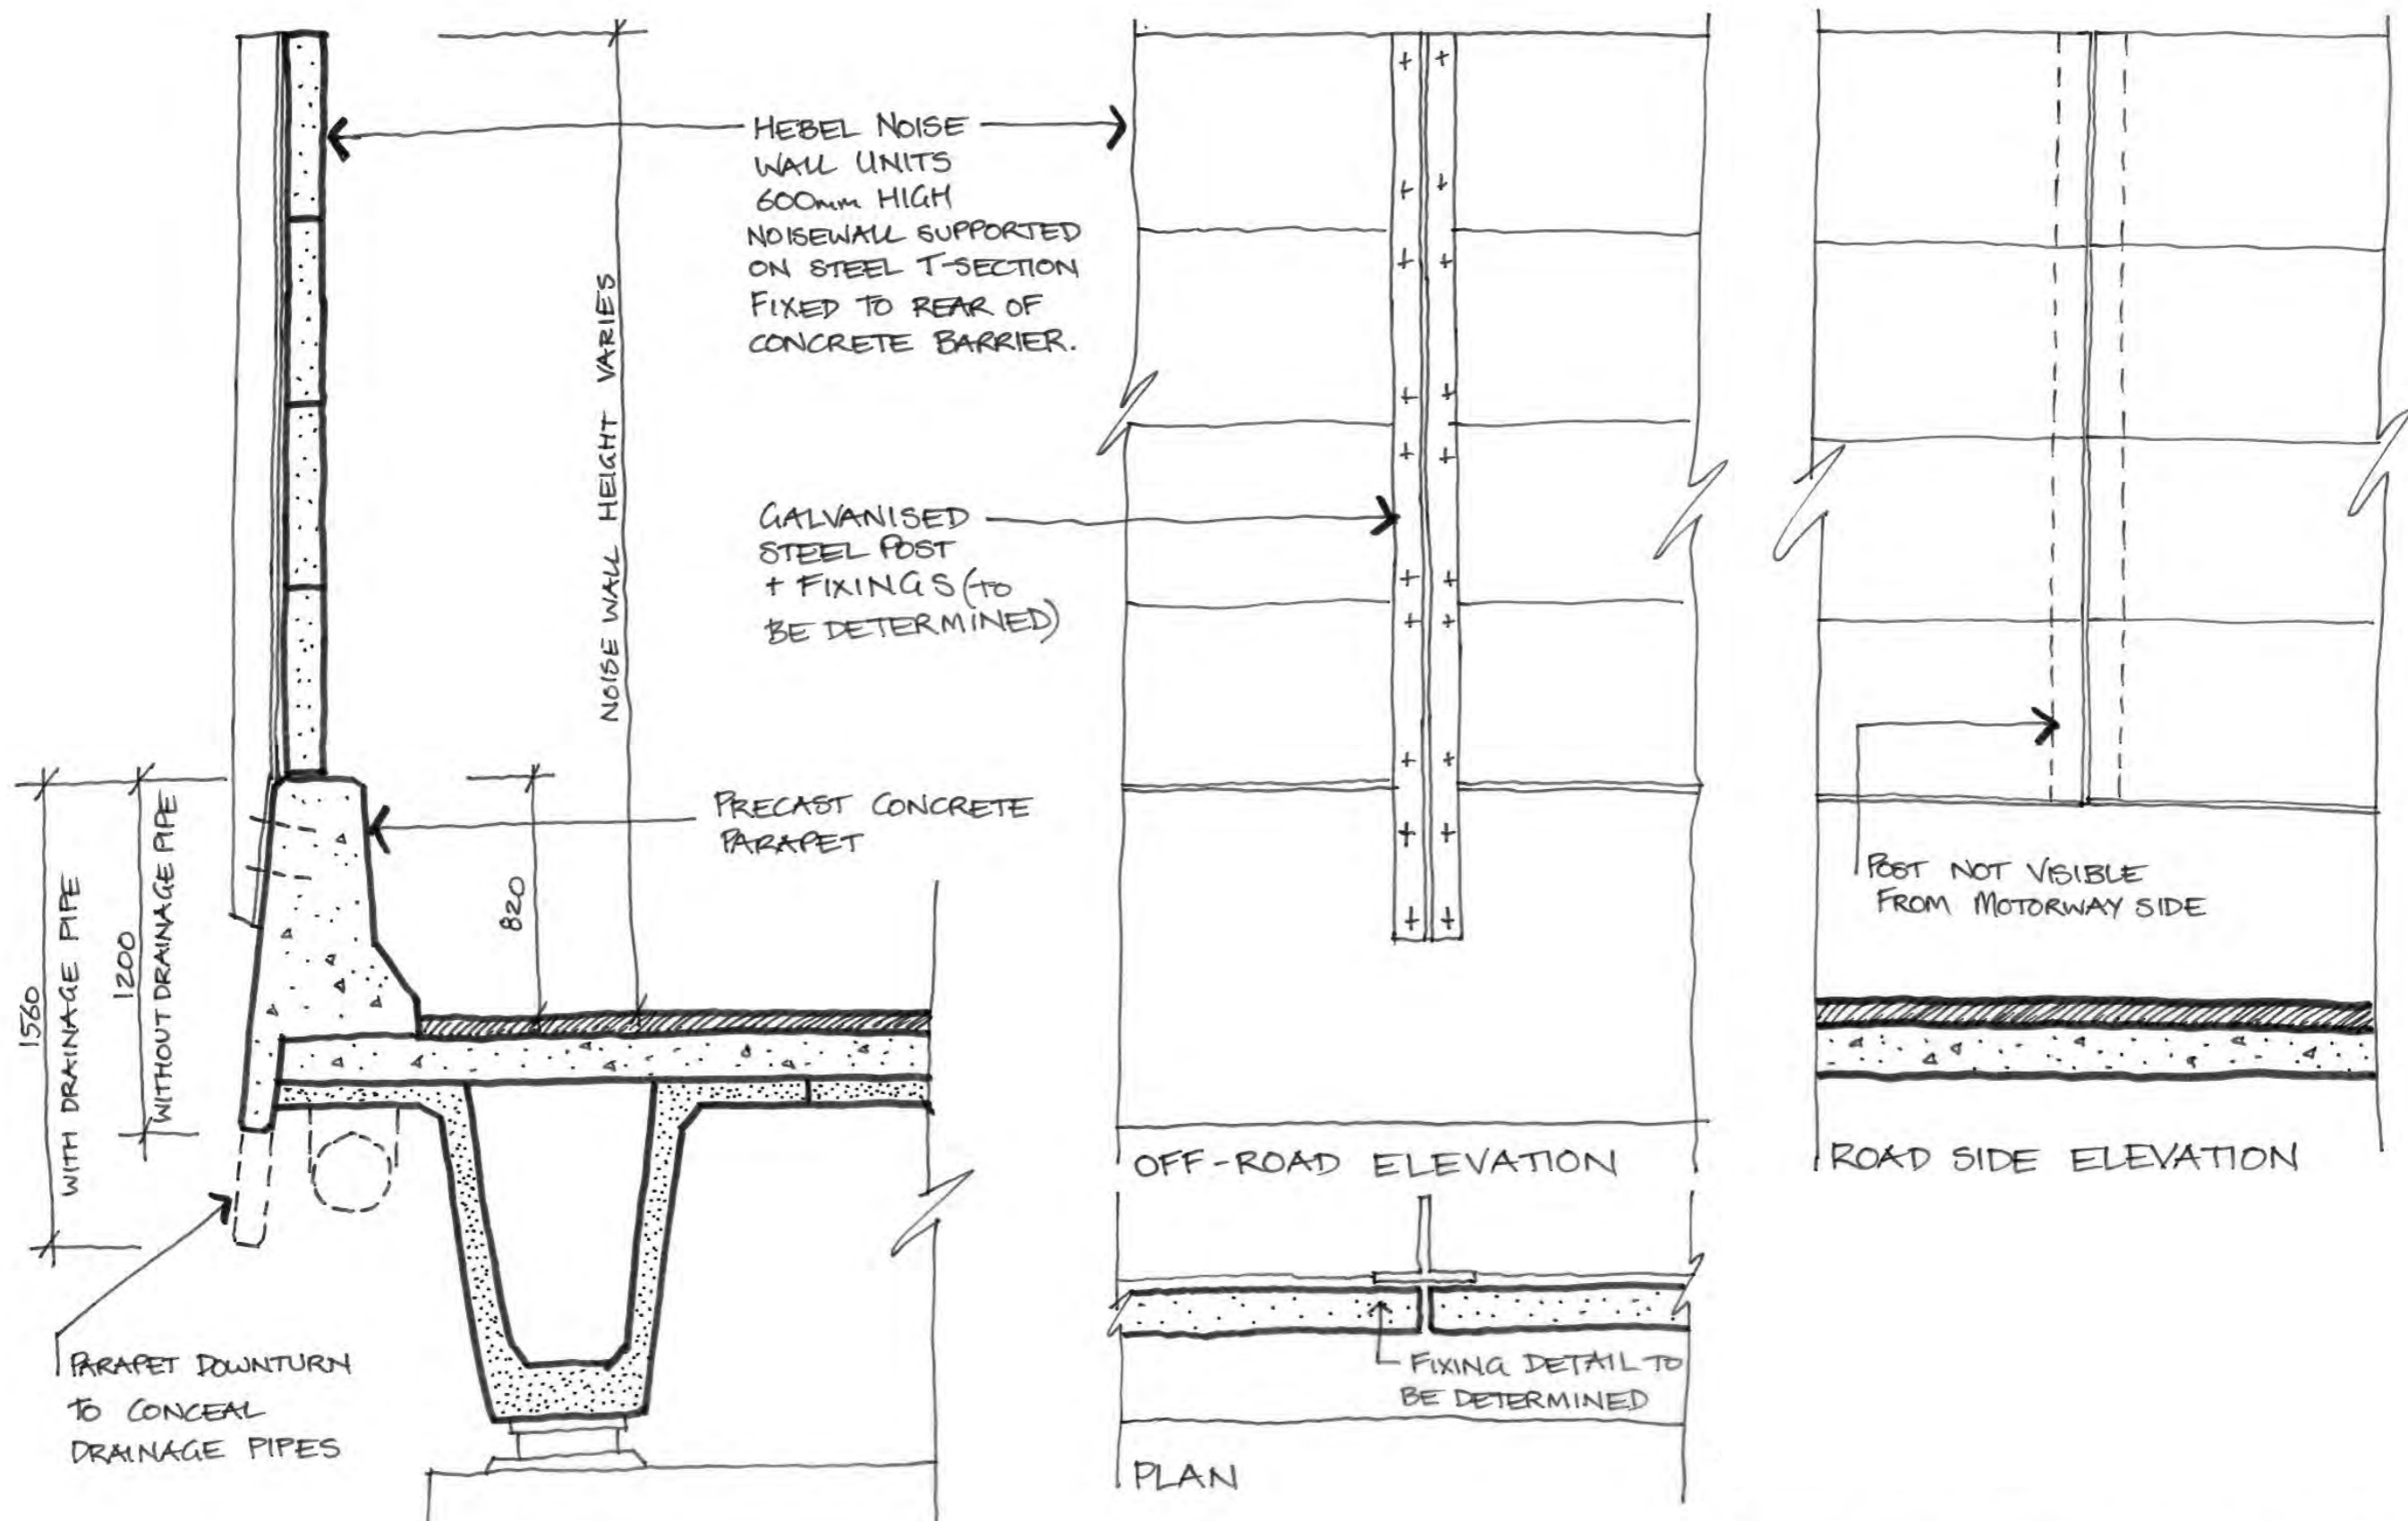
Typical Bridge Parapet Detail as used on Darling Mills Creek Road, Yale Close Bridge and Devlins Creek Bridge
